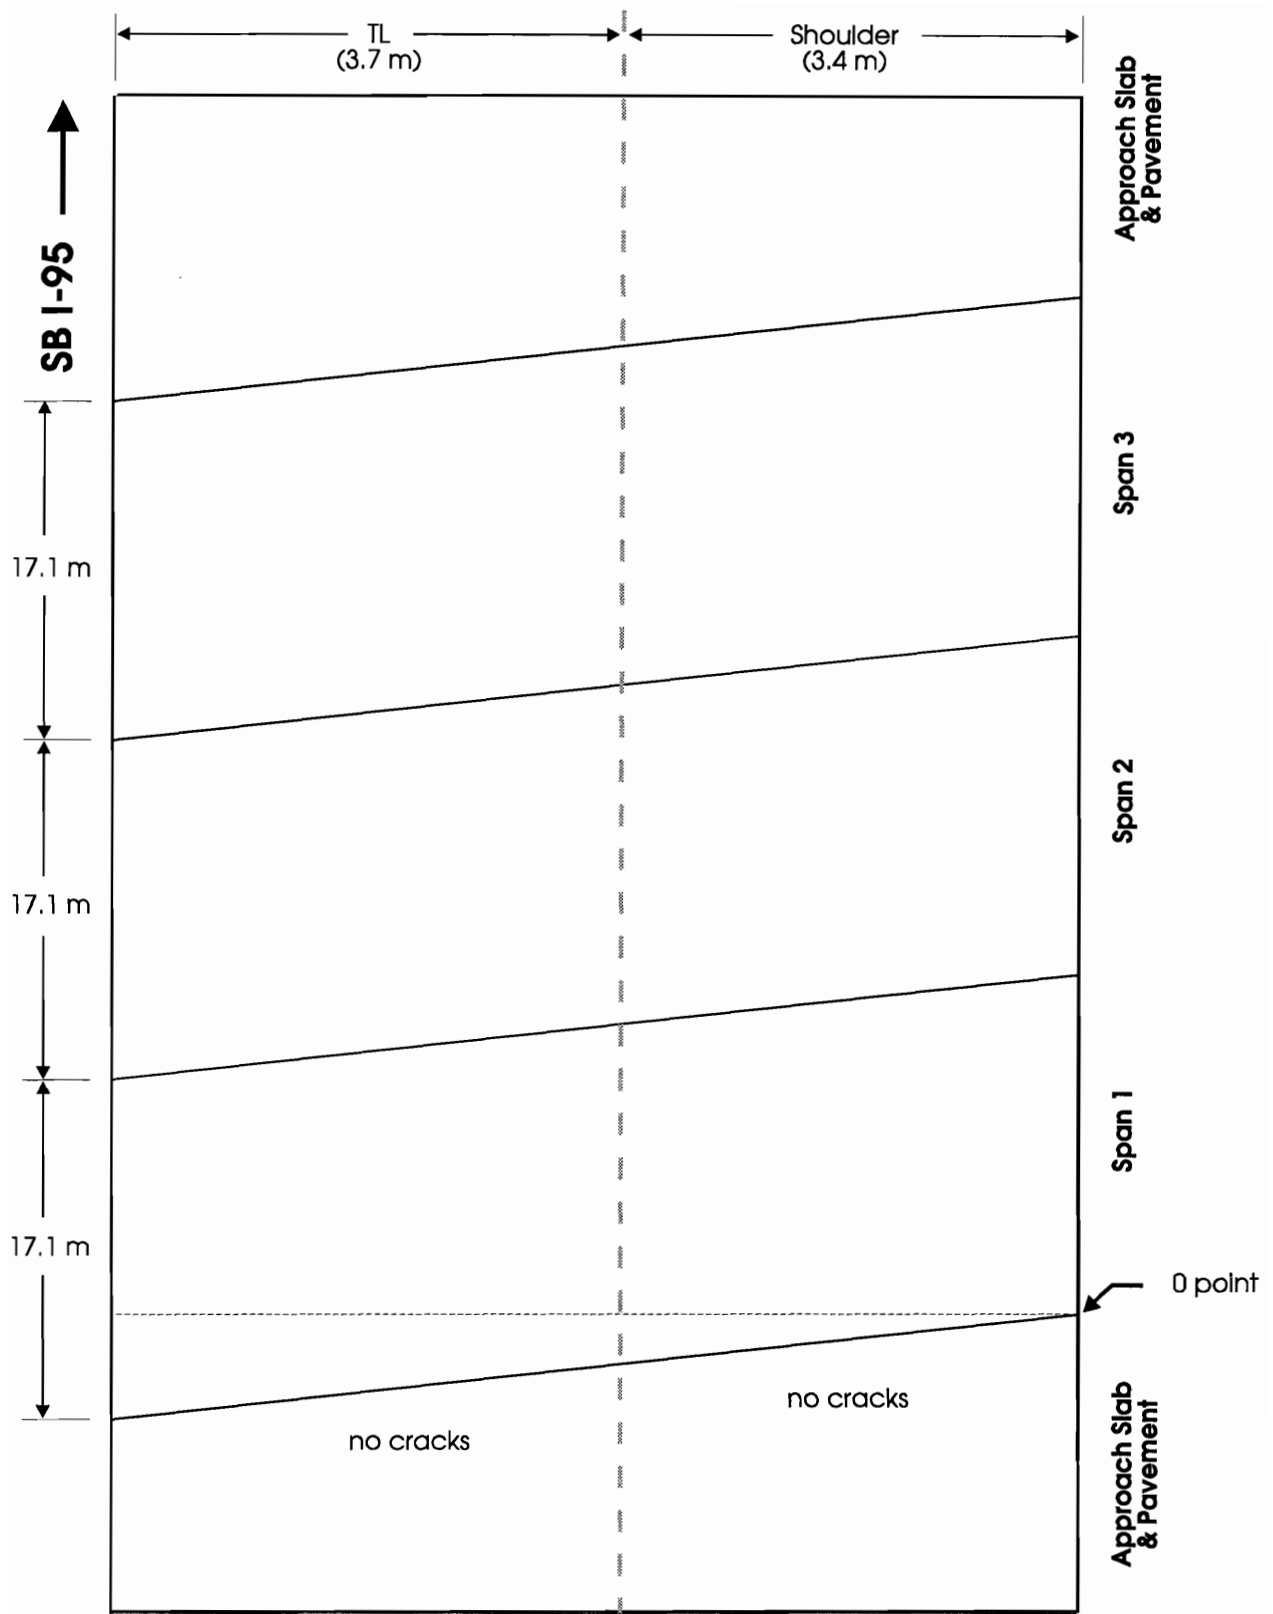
Cracks and delaminations in Bridge 1 SBL, TL and shoulder.
